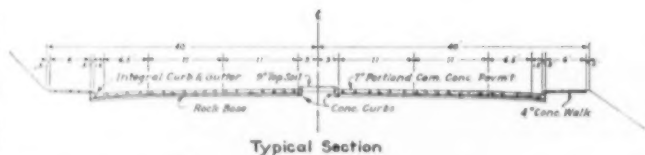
Typical Cross Section of Cottage Grove Project. Note Crushed Rock Base Course Six-Foot Parting Strip. Room for Longitudinal Parking Has Been Allowed and Yet Leaves Two Eleven-Foot Lanes
